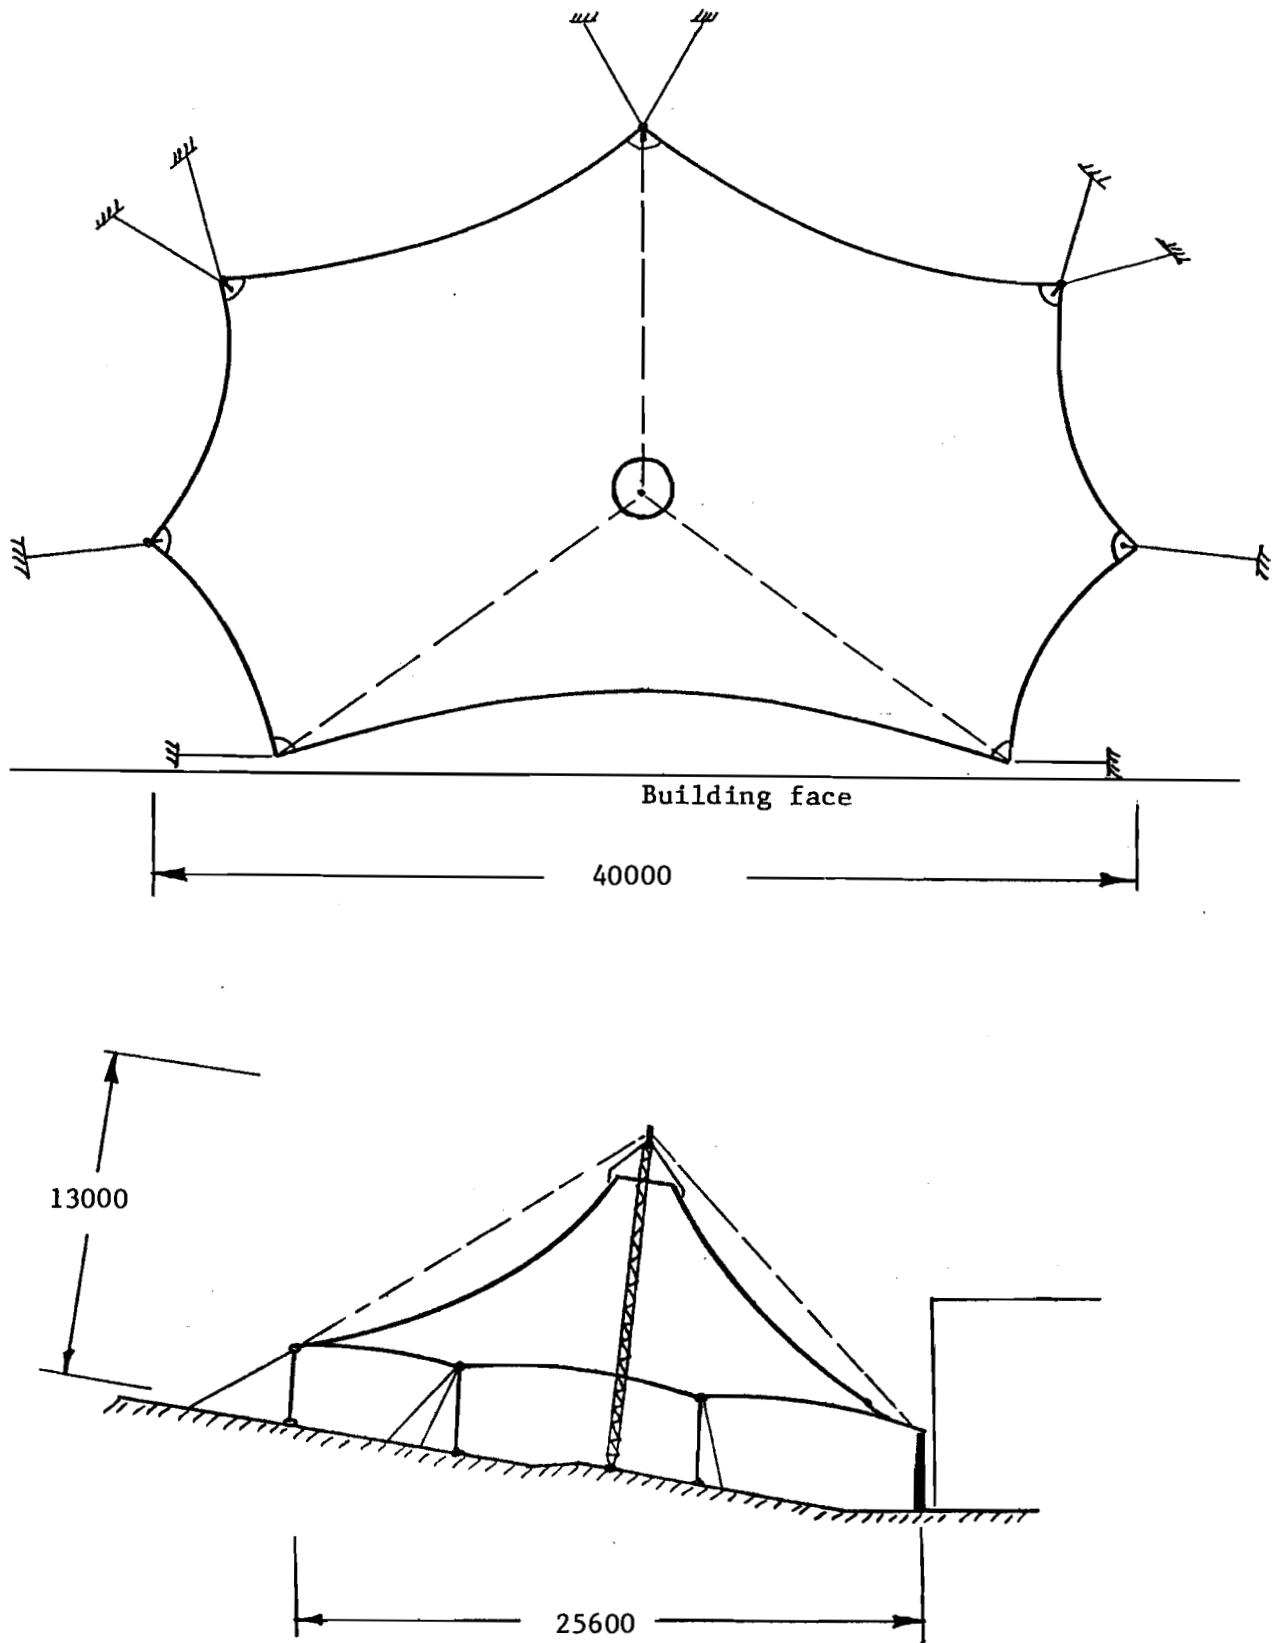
PLAN AND SECTION OF AMPHITHEATRE ROOF (EUROA)
